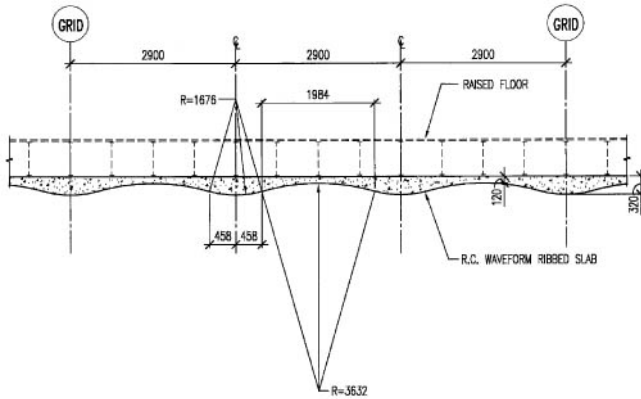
Cross section of the wave slab geometry (mm).
